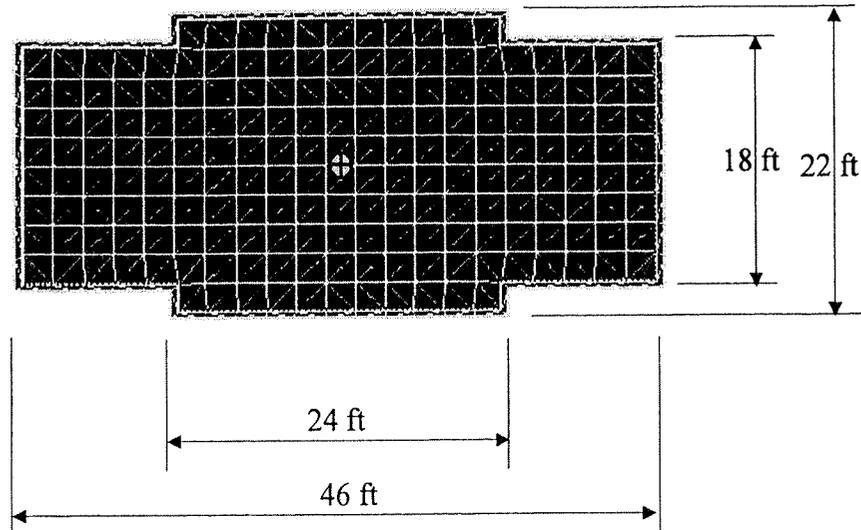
Section shape at bottom of Pier E1 (either south or north side)
